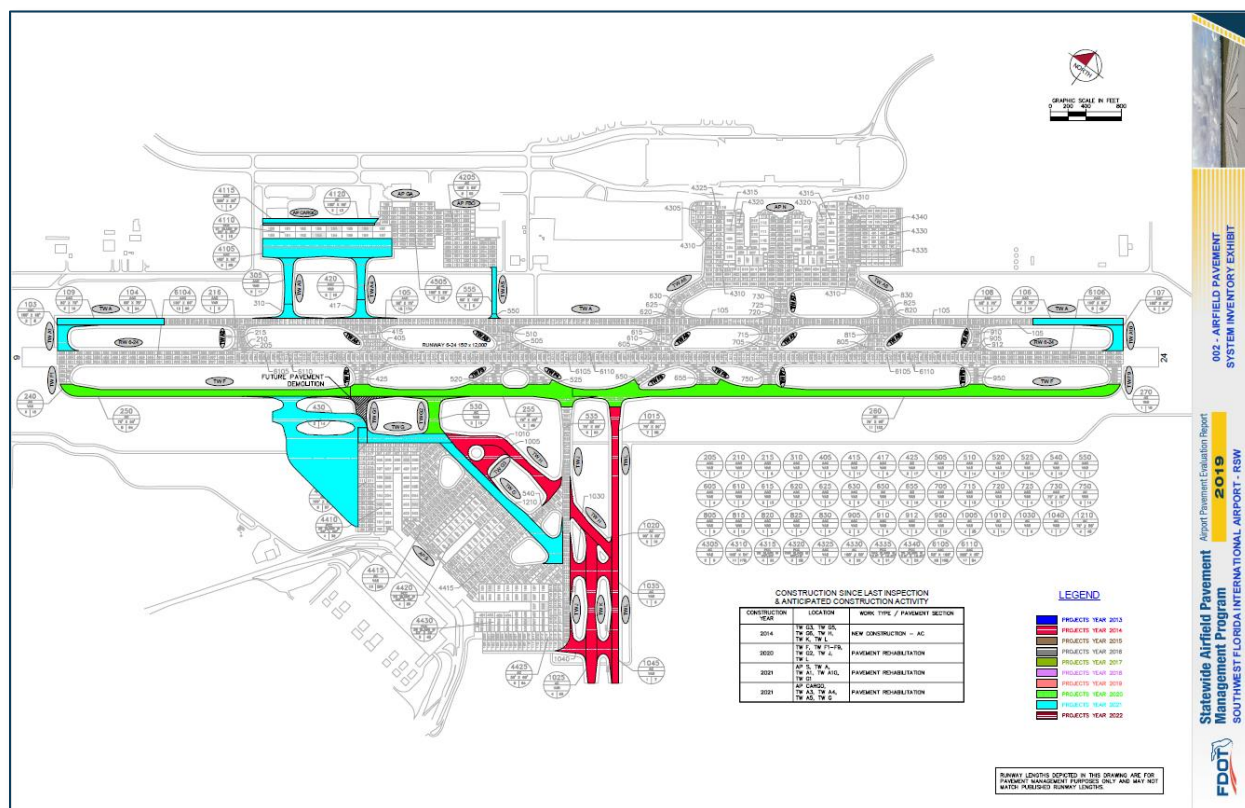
(a) 2019 Airfield Pavement Network Definition Exhibit
